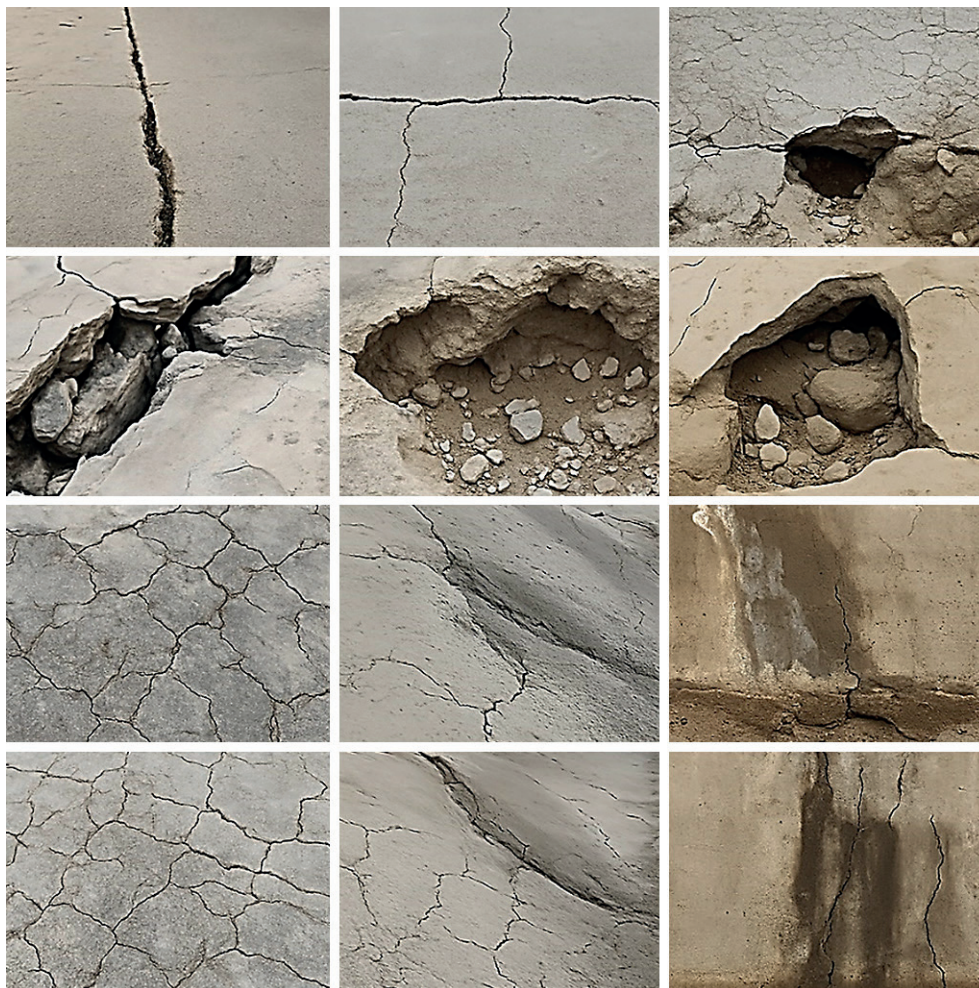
Typical defects and cracks in concrete linings of irrigation canals
